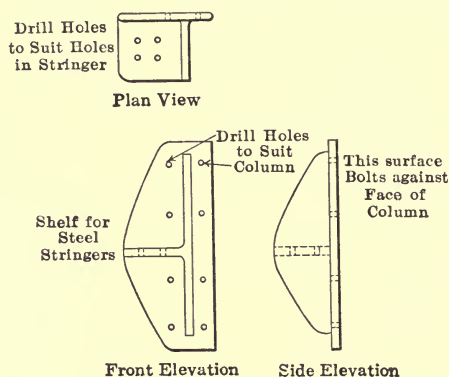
DETAIL OF CAST-IRON END BRACKET.
